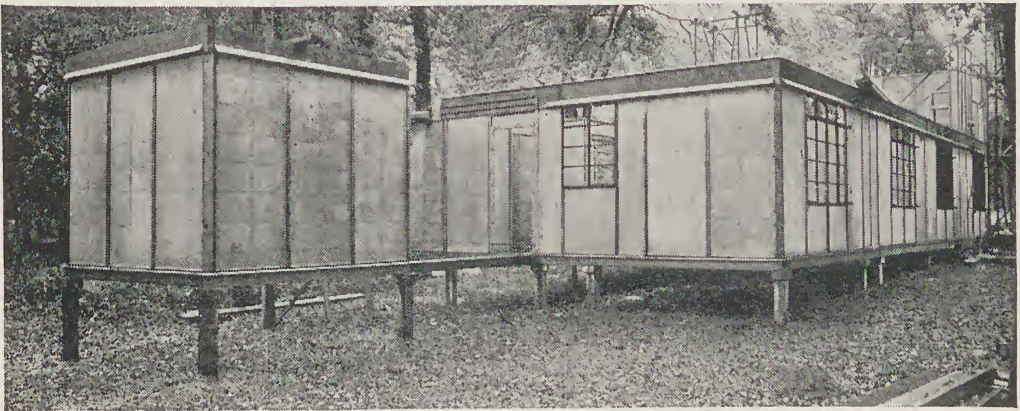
“Seco” prefabricated houses—erection of ground-floor walls.
